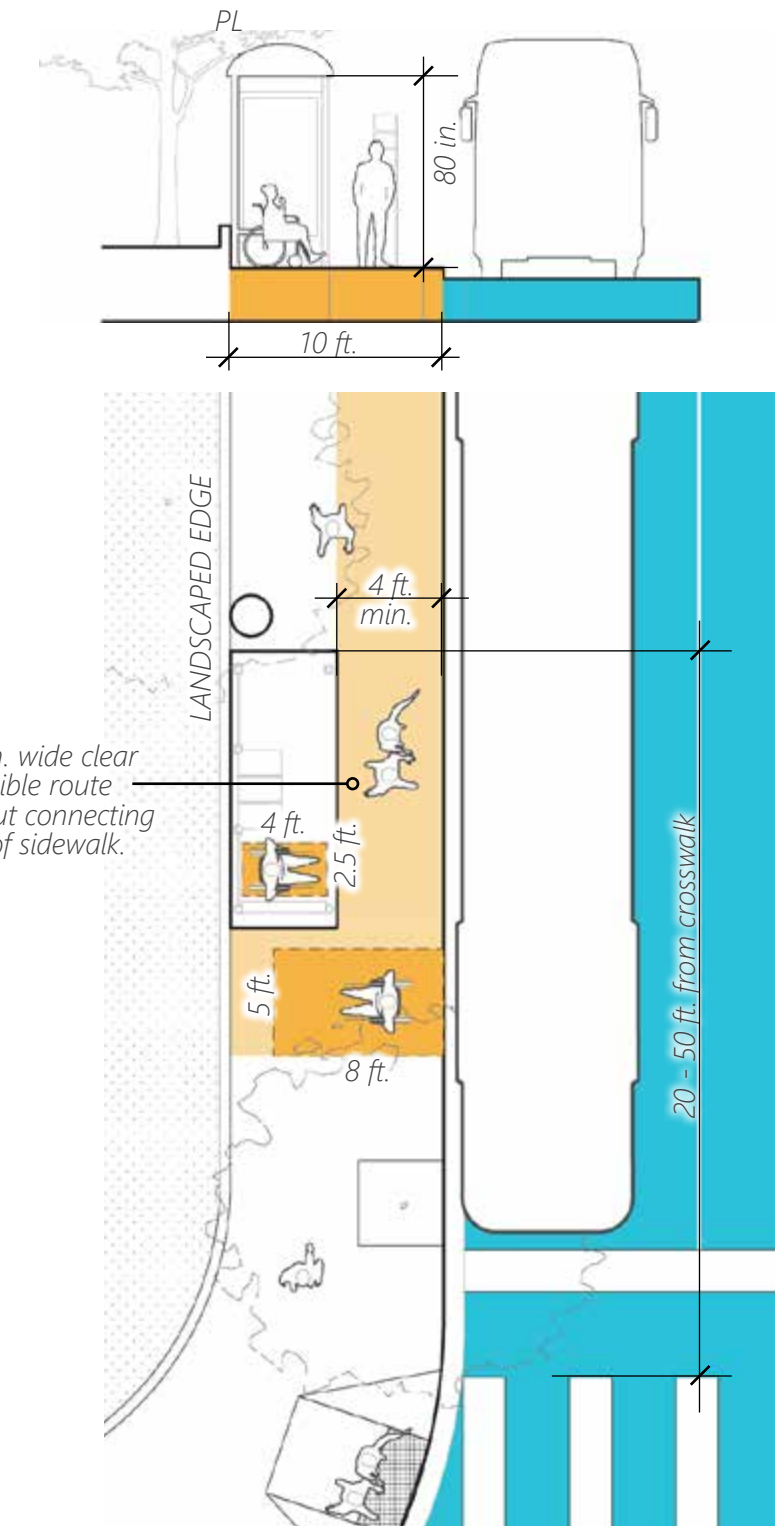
Near Side, Pull-Out Loading Bus Stop at a 10 ft. Wide Sidewalk along a Landscaped Edge.
